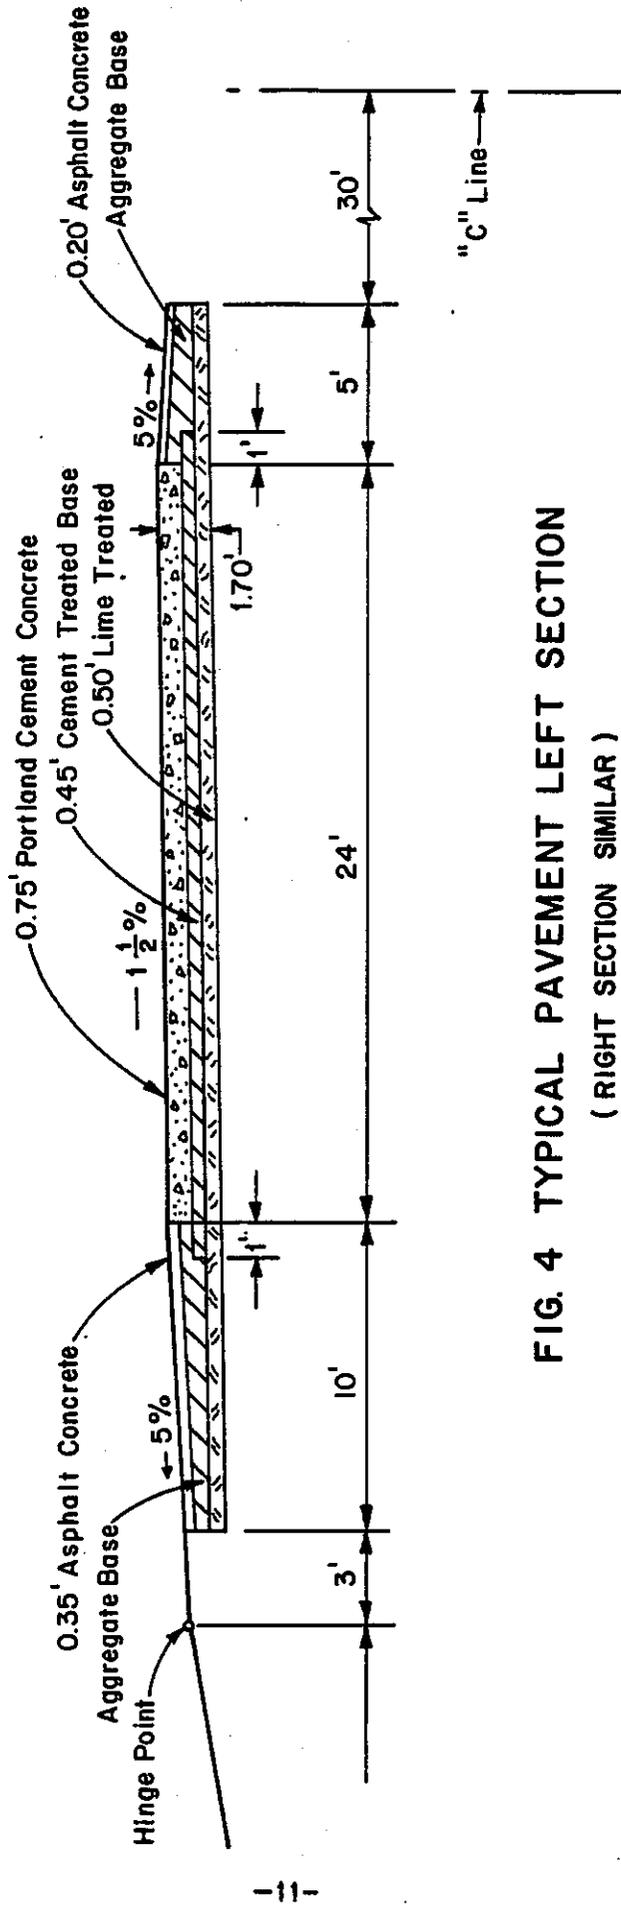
TYPICAL PAVEMENT LEFT SECTION
